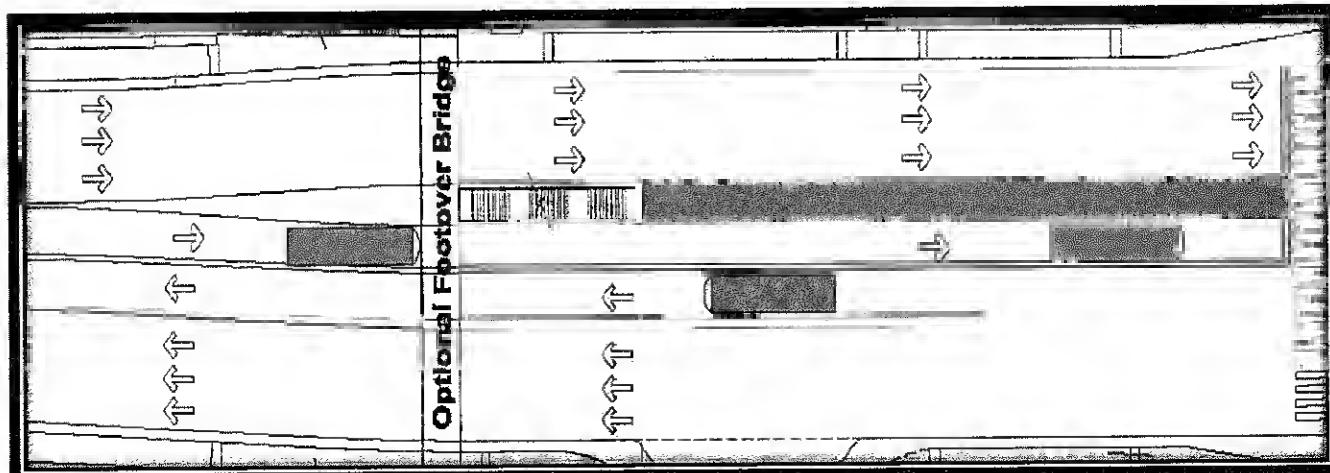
Access to a Sheltered Overhead Pedestrian Bridge with Steps
